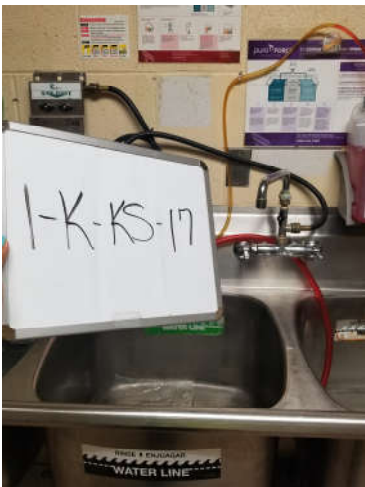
Kitchen sink, located on the 1st floor in the kitchen.
